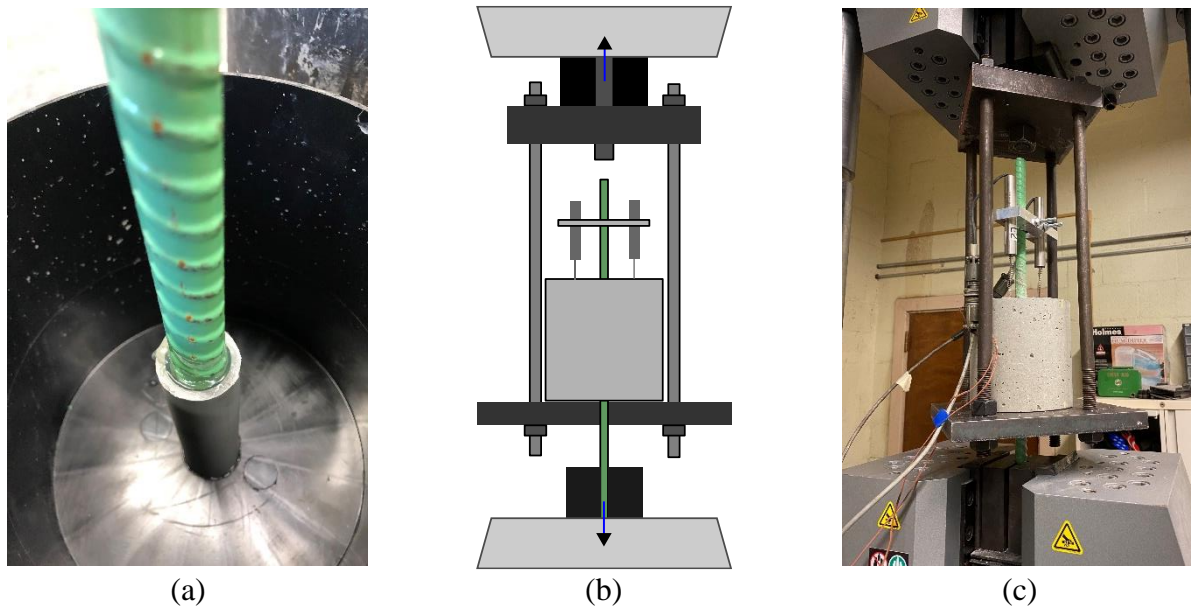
(a) Debonded section of the specimen, (b) test diagram, (c) testing setup
